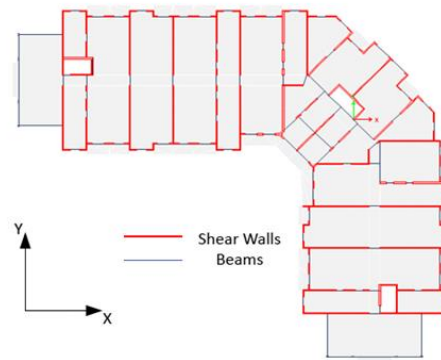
Schematic Plan View of Building C (L-Shaped Building)
